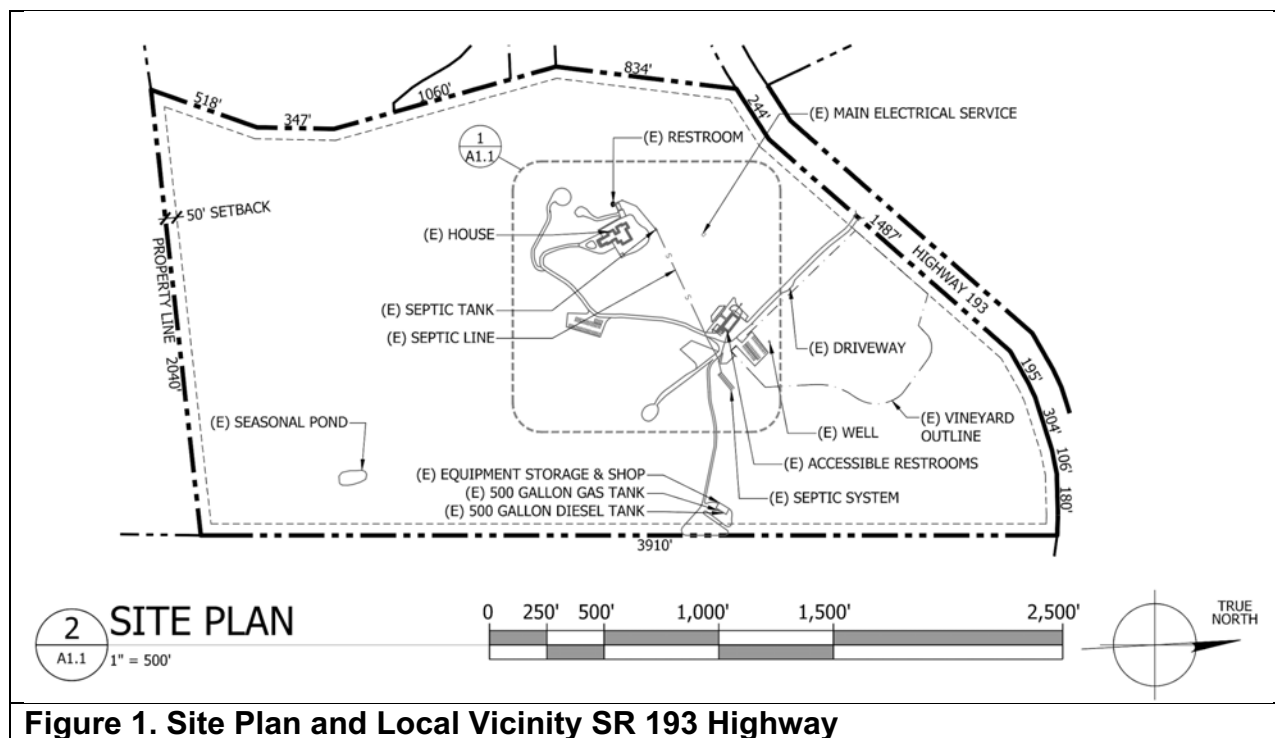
Site Plan and Local Vicinity SR 193 Highway
